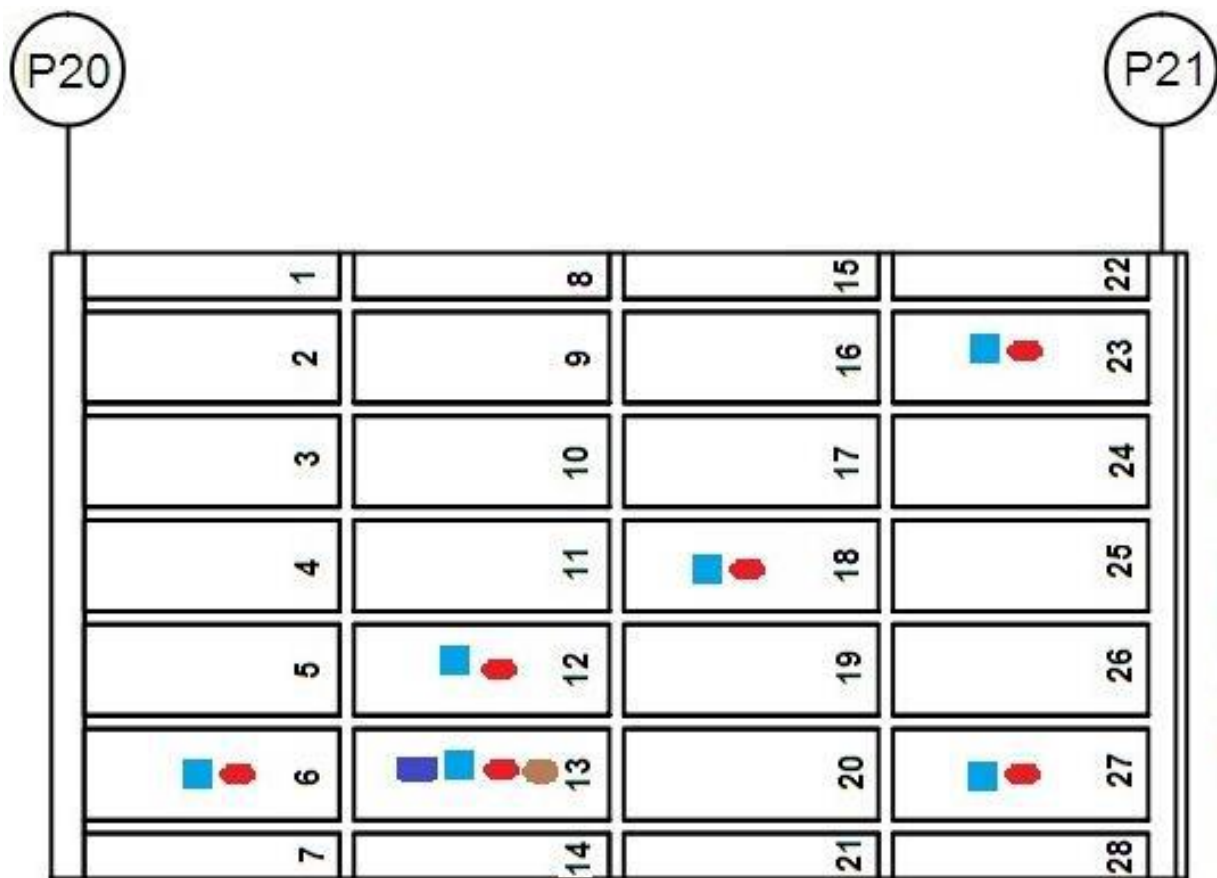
Test conducted at various locations between Pier P20 and Pier P21
